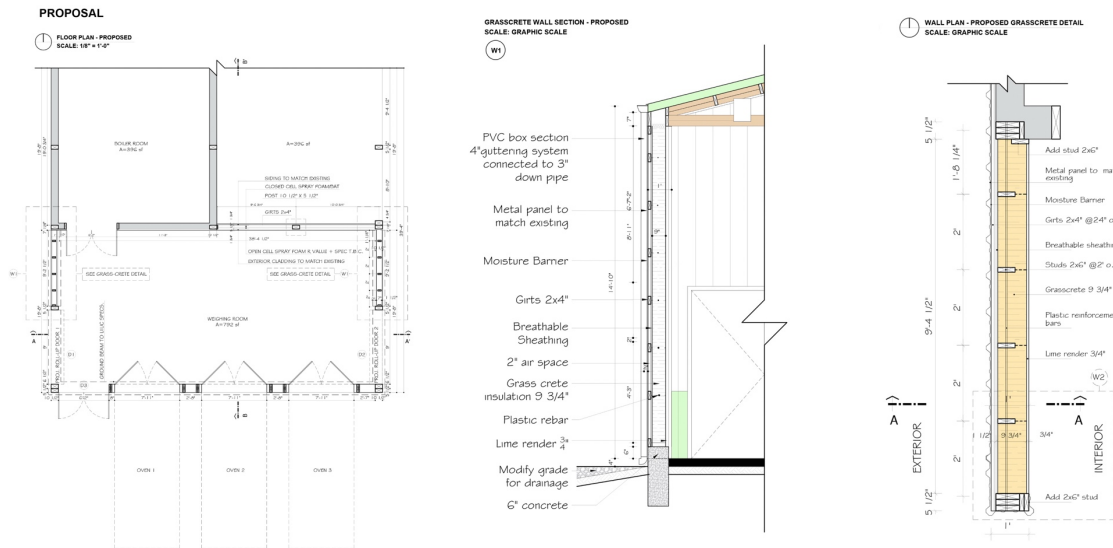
Mockup wall construction. Source: (Luis Felipe Flores Garzon and Author 2019)
